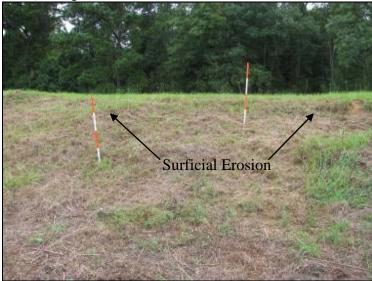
Ash Pond – North embankment interior slope, surficial erosion (30-feet long) looking northwest.
